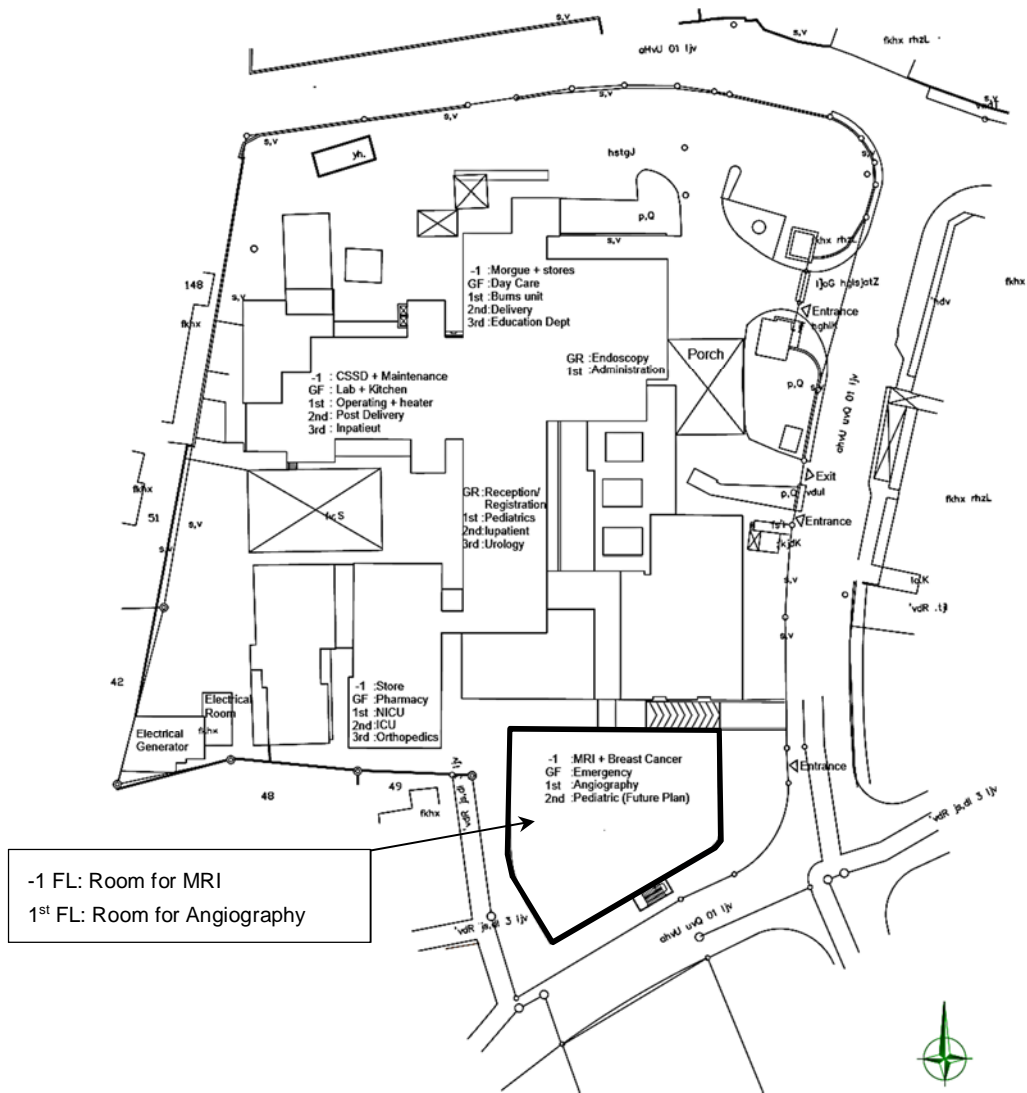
Layout plan of Rafidia Surgery Hospital
